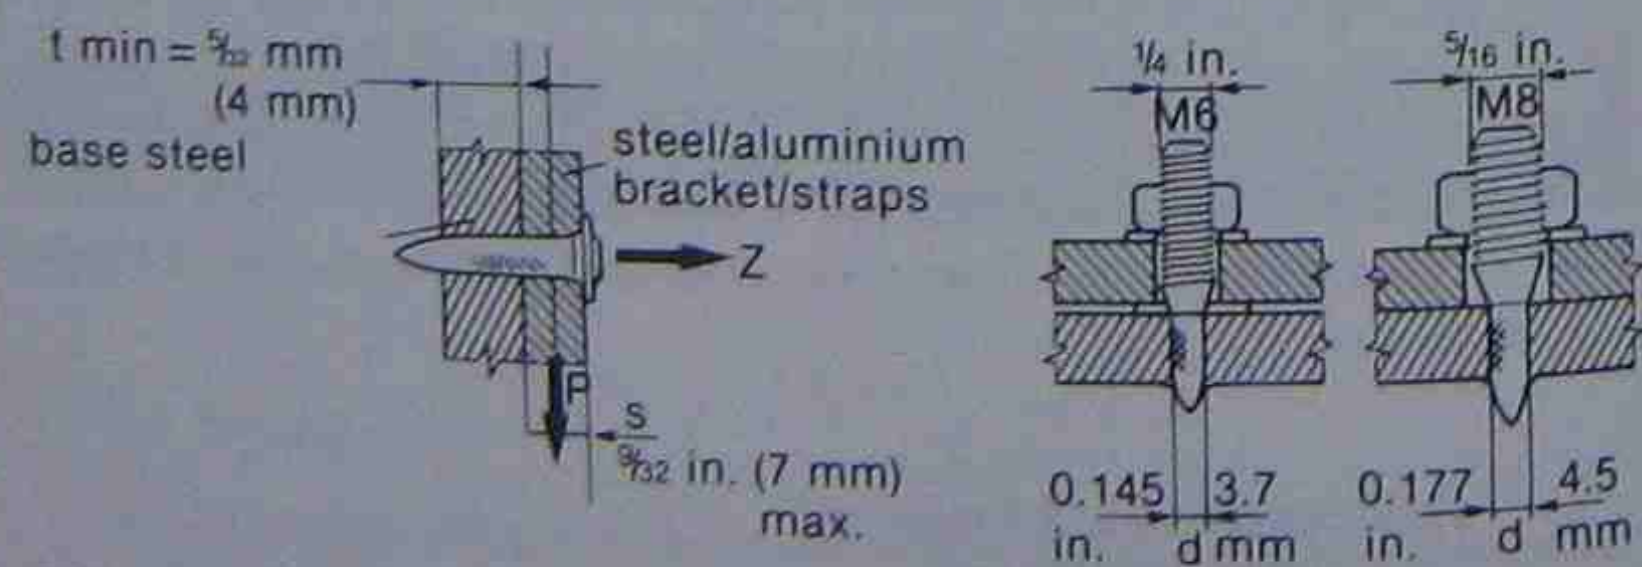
Fired fixing types (a) drive pin (b) threaded studs
